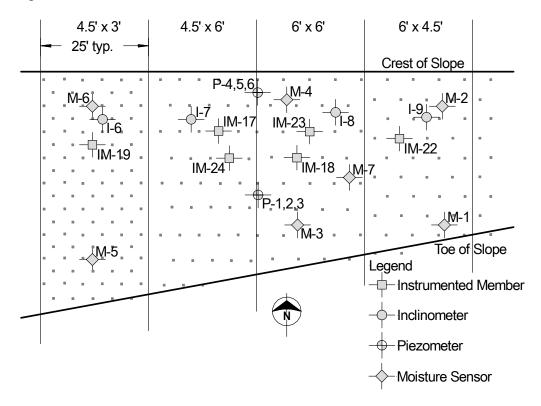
Plan view of slide area S3 at the I70-Emma site showing locations of instrumentation.
